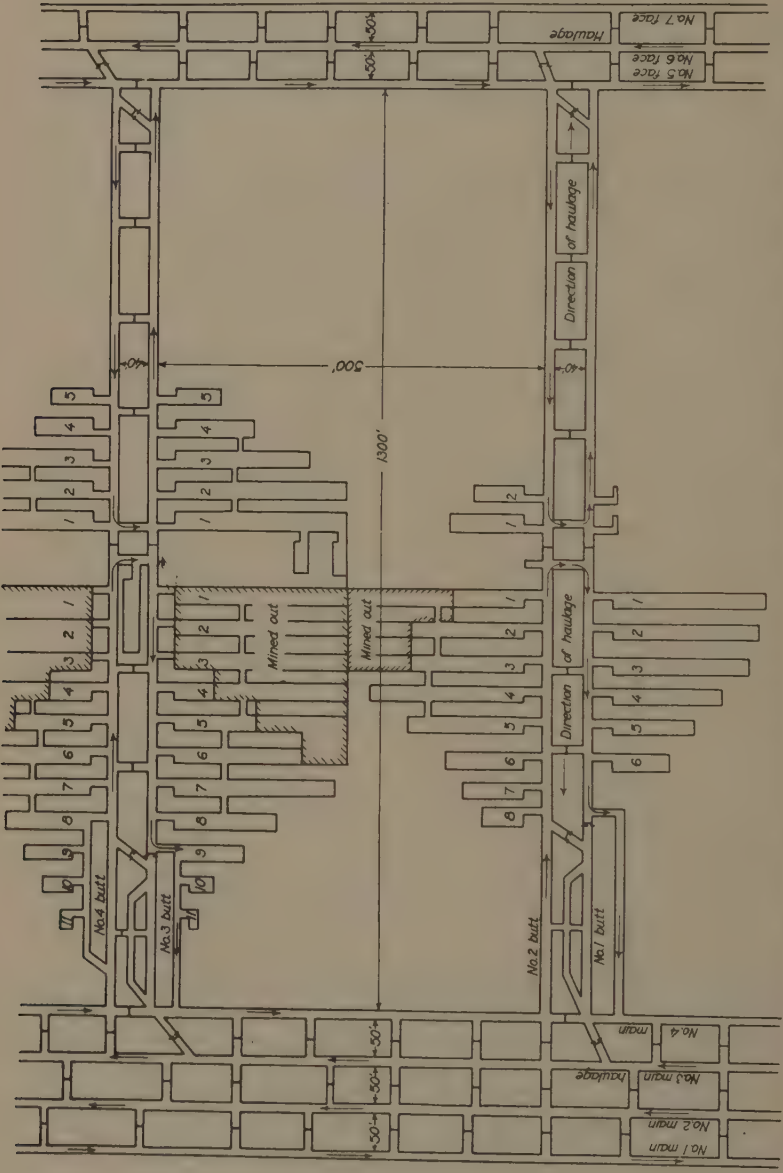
Sketch showing system of drawing ribs on long butt entries, Pittsburgh Coal Bed, Western Pennsylvania.
